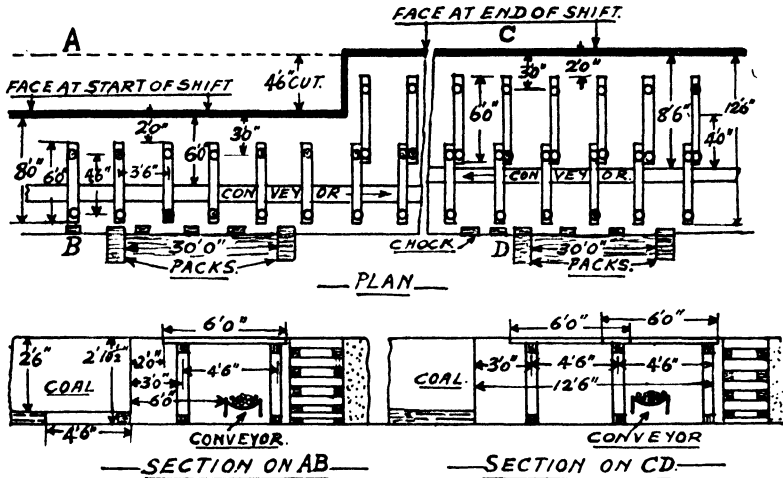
Plan and Sections showing Longwall Face Supports.
